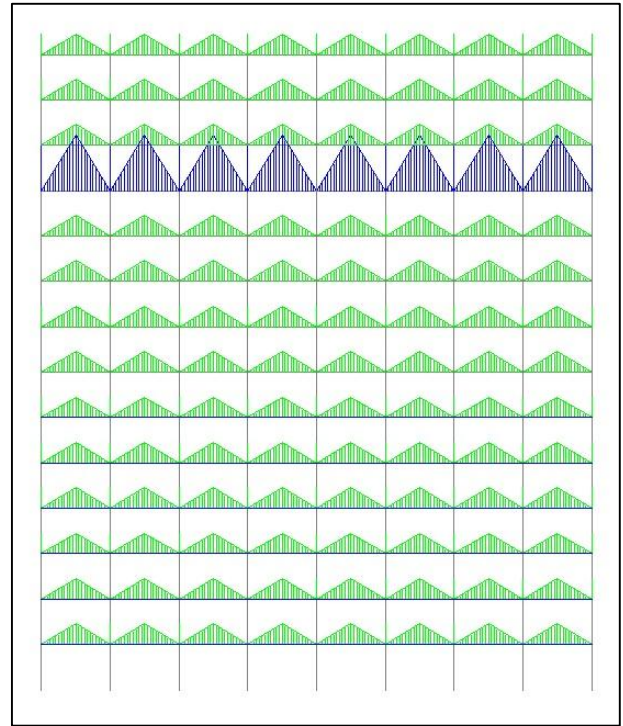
Mass Irregularity at 11th floor of 14 Storey Building.
